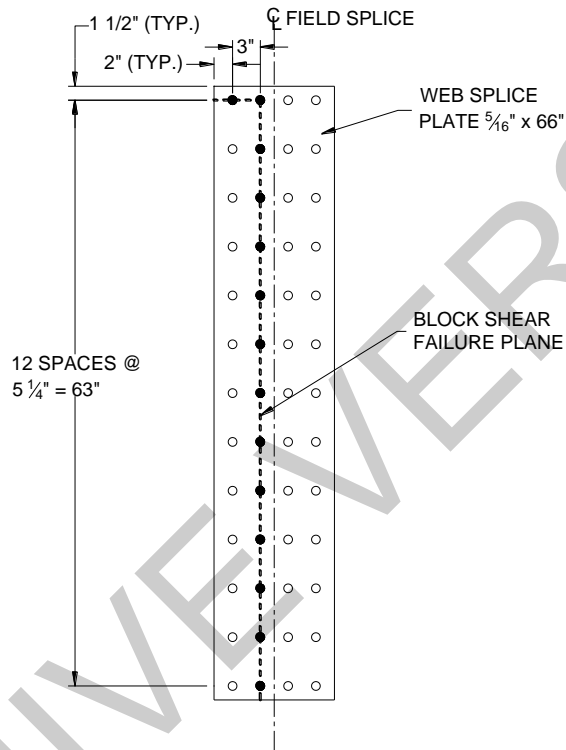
Assumed Block Shear Failure Plane in the Web Splice Plates
